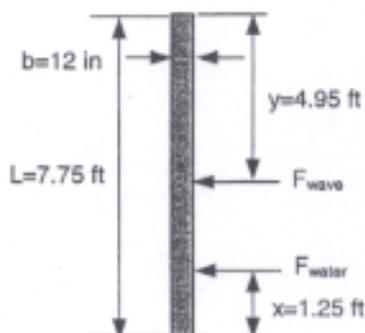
Hydrostatic and hydrodynamic forces acting on a retaining wall.
